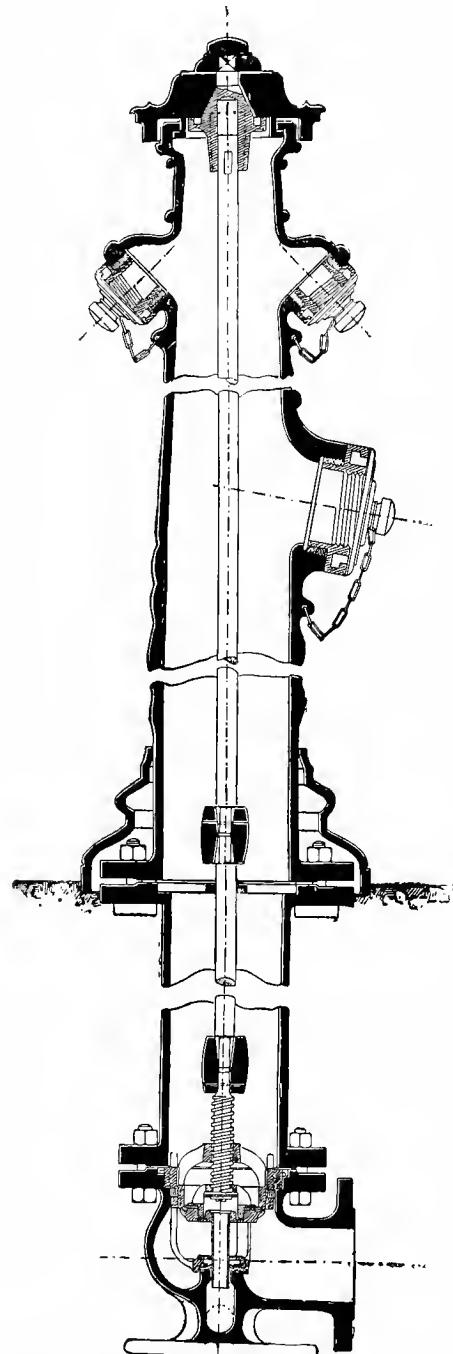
HYDRANT STANDARD. TYPICAL SECTION OF HYDRANT STANDARDS IN SOUTH GERMANY
